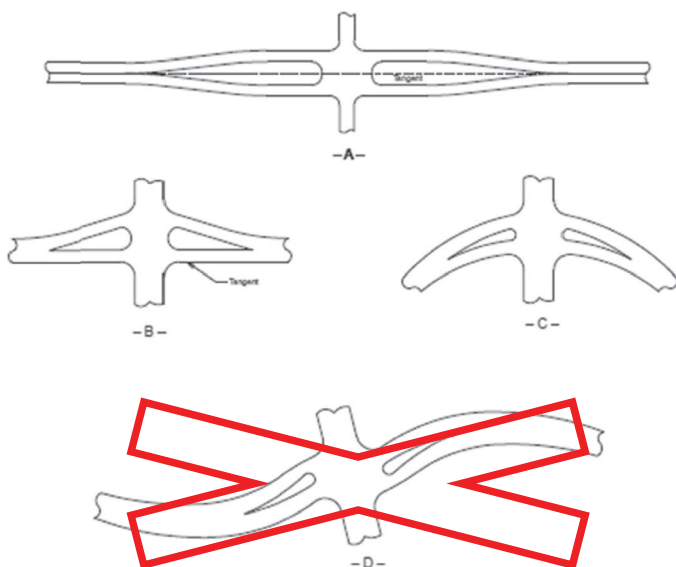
Alignment for Addition of Divisional Islands at Intersections
